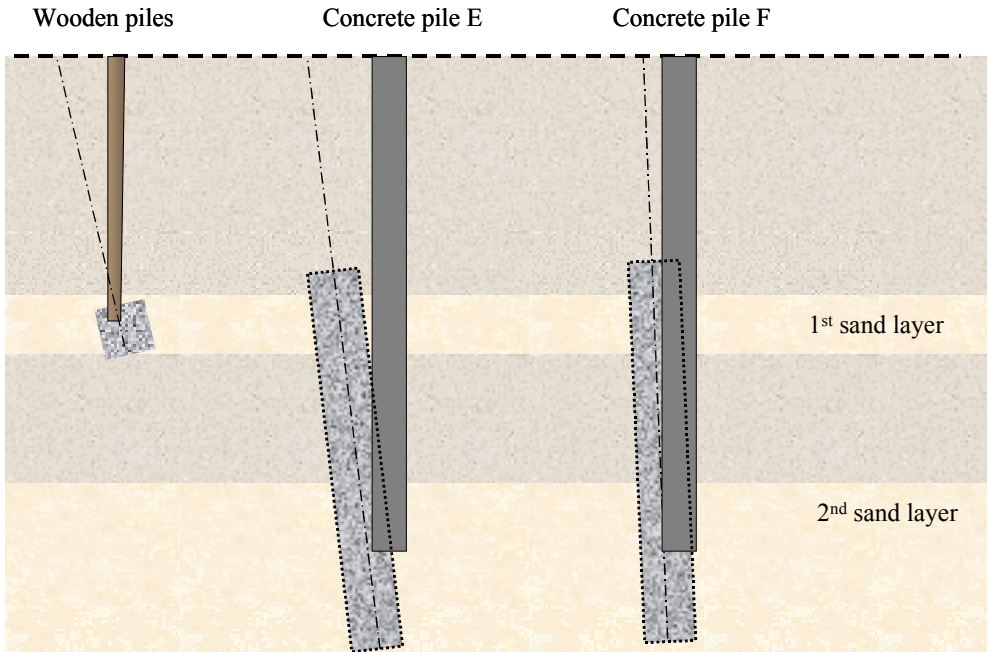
Cross Section of Jet Grouting for Foundation Renovation: Pile Extension Columns E, F and W
